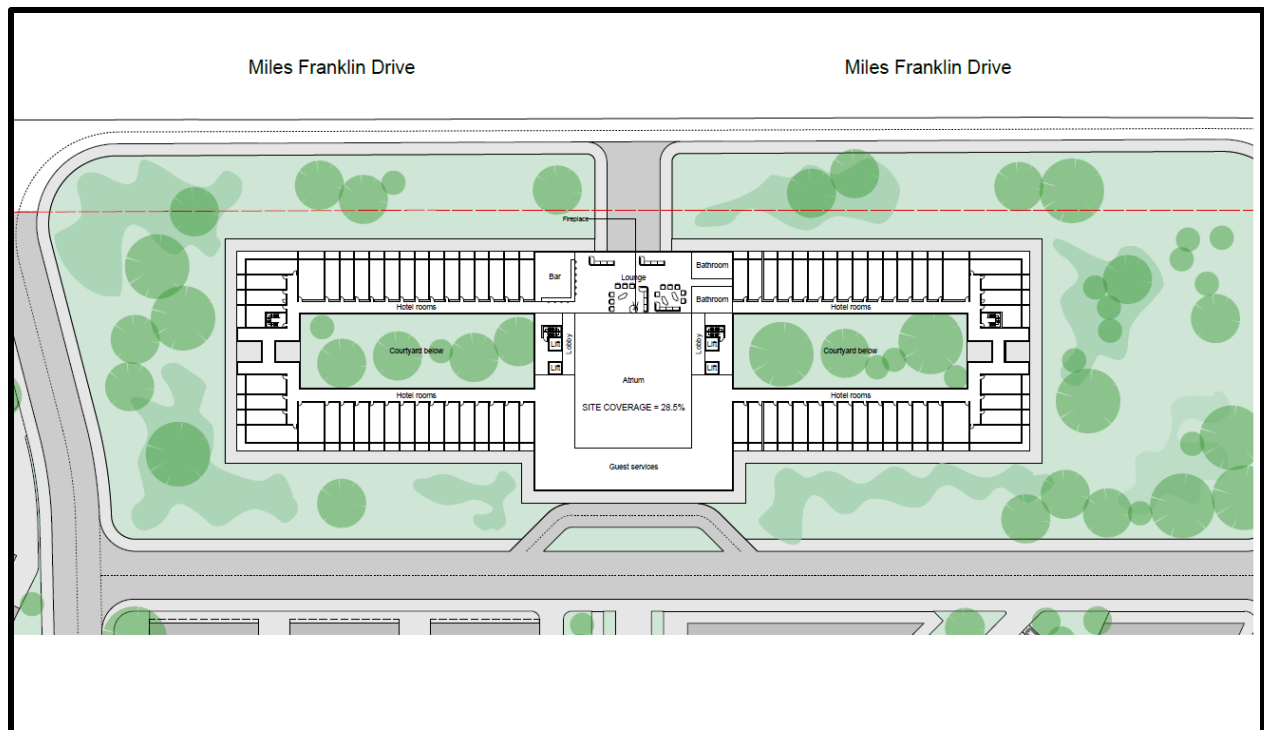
Spa Hotel First and Second Floor Plans (Source: Robert Harwood Architects)
